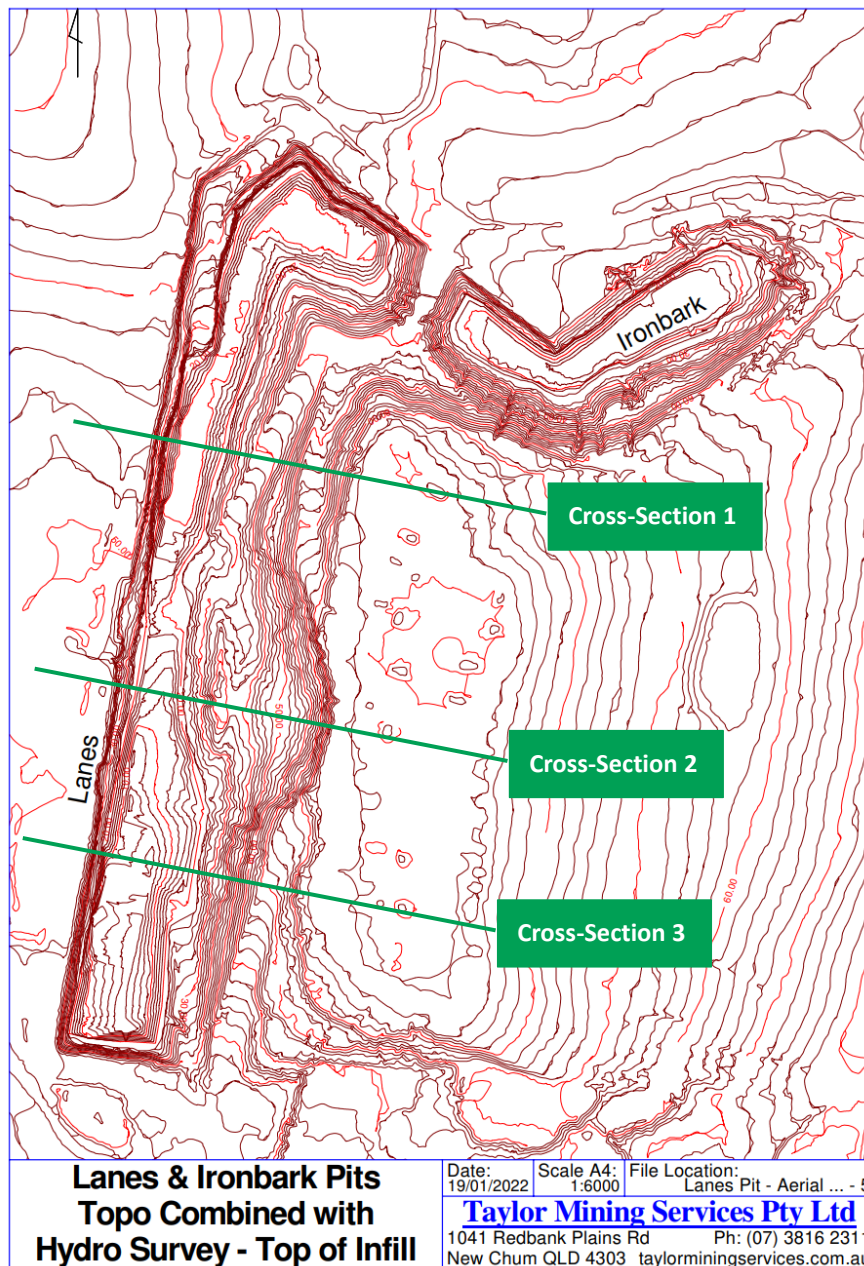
Contour Plan of Lane’s Pit with the location of the analysed cross-section.
